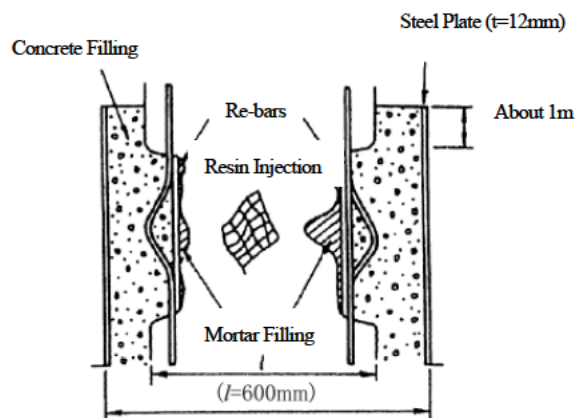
Emergency Measure for Damaged Section of Reinforced Concrete Piers
